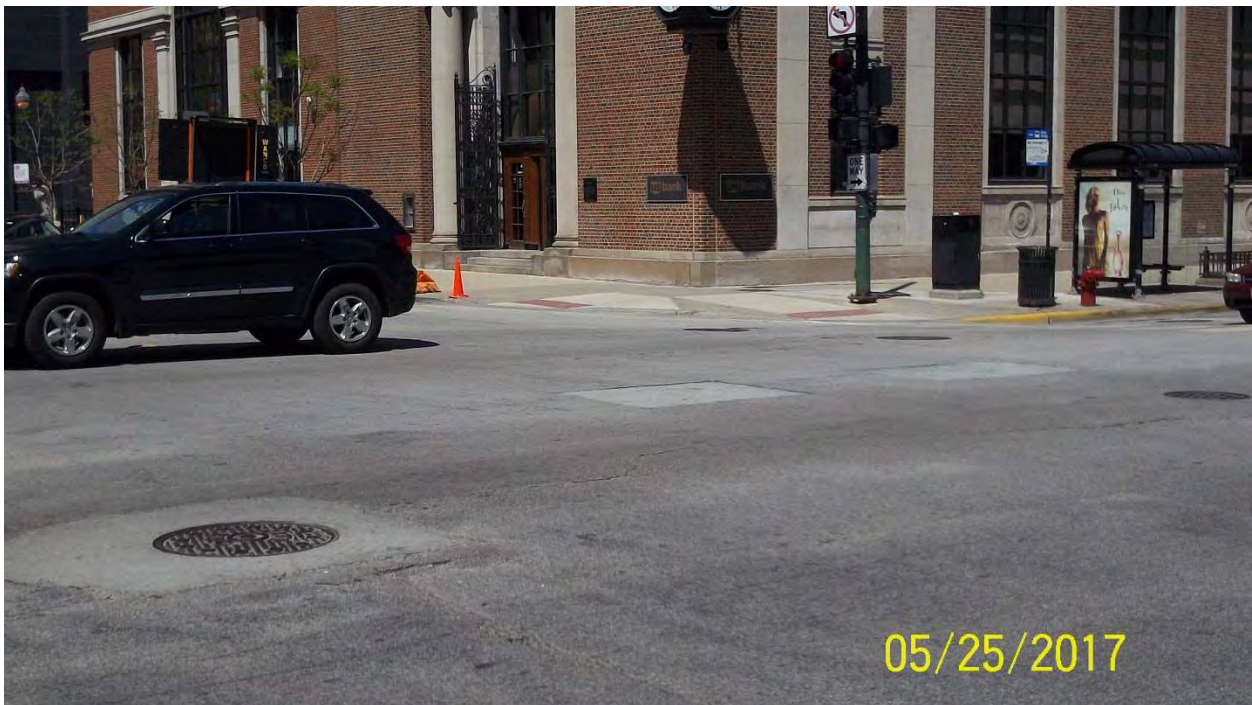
Southwest corner of Chicago Ave. / Clark St. – Looking Northeast
